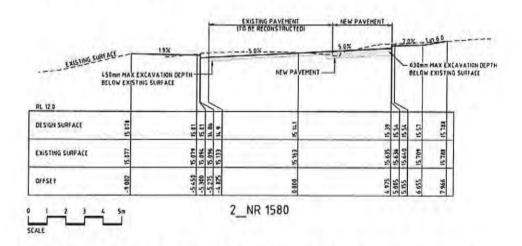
Civil Works Cross Section at 2\_NR 1580, near the Play Ground Park north of Fort Scratchley's driveway (Fort Drive).
